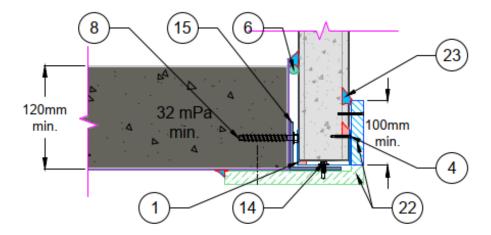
Base – vertical or horizontal wall connected to stringer via structural support (section view)
